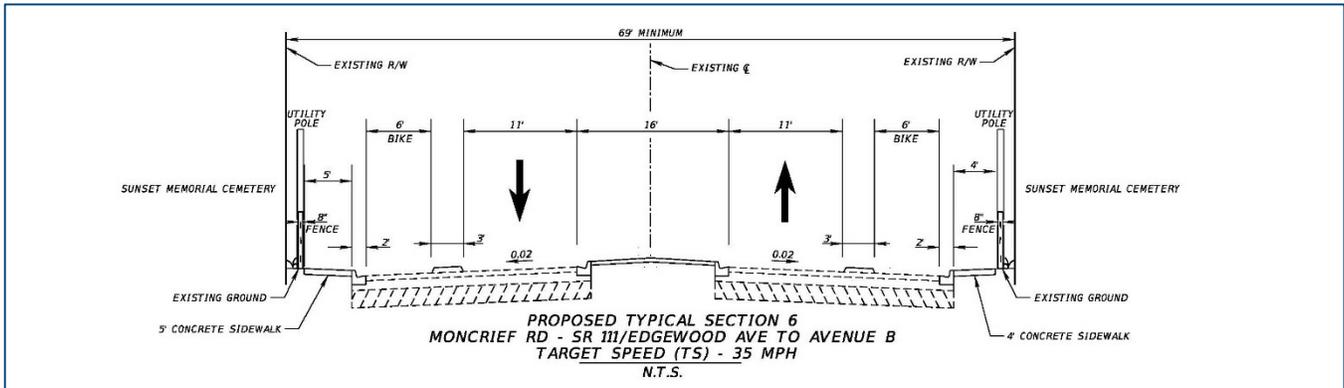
Proposed Typical Section (Edgewood Avenue to Avenue B)
